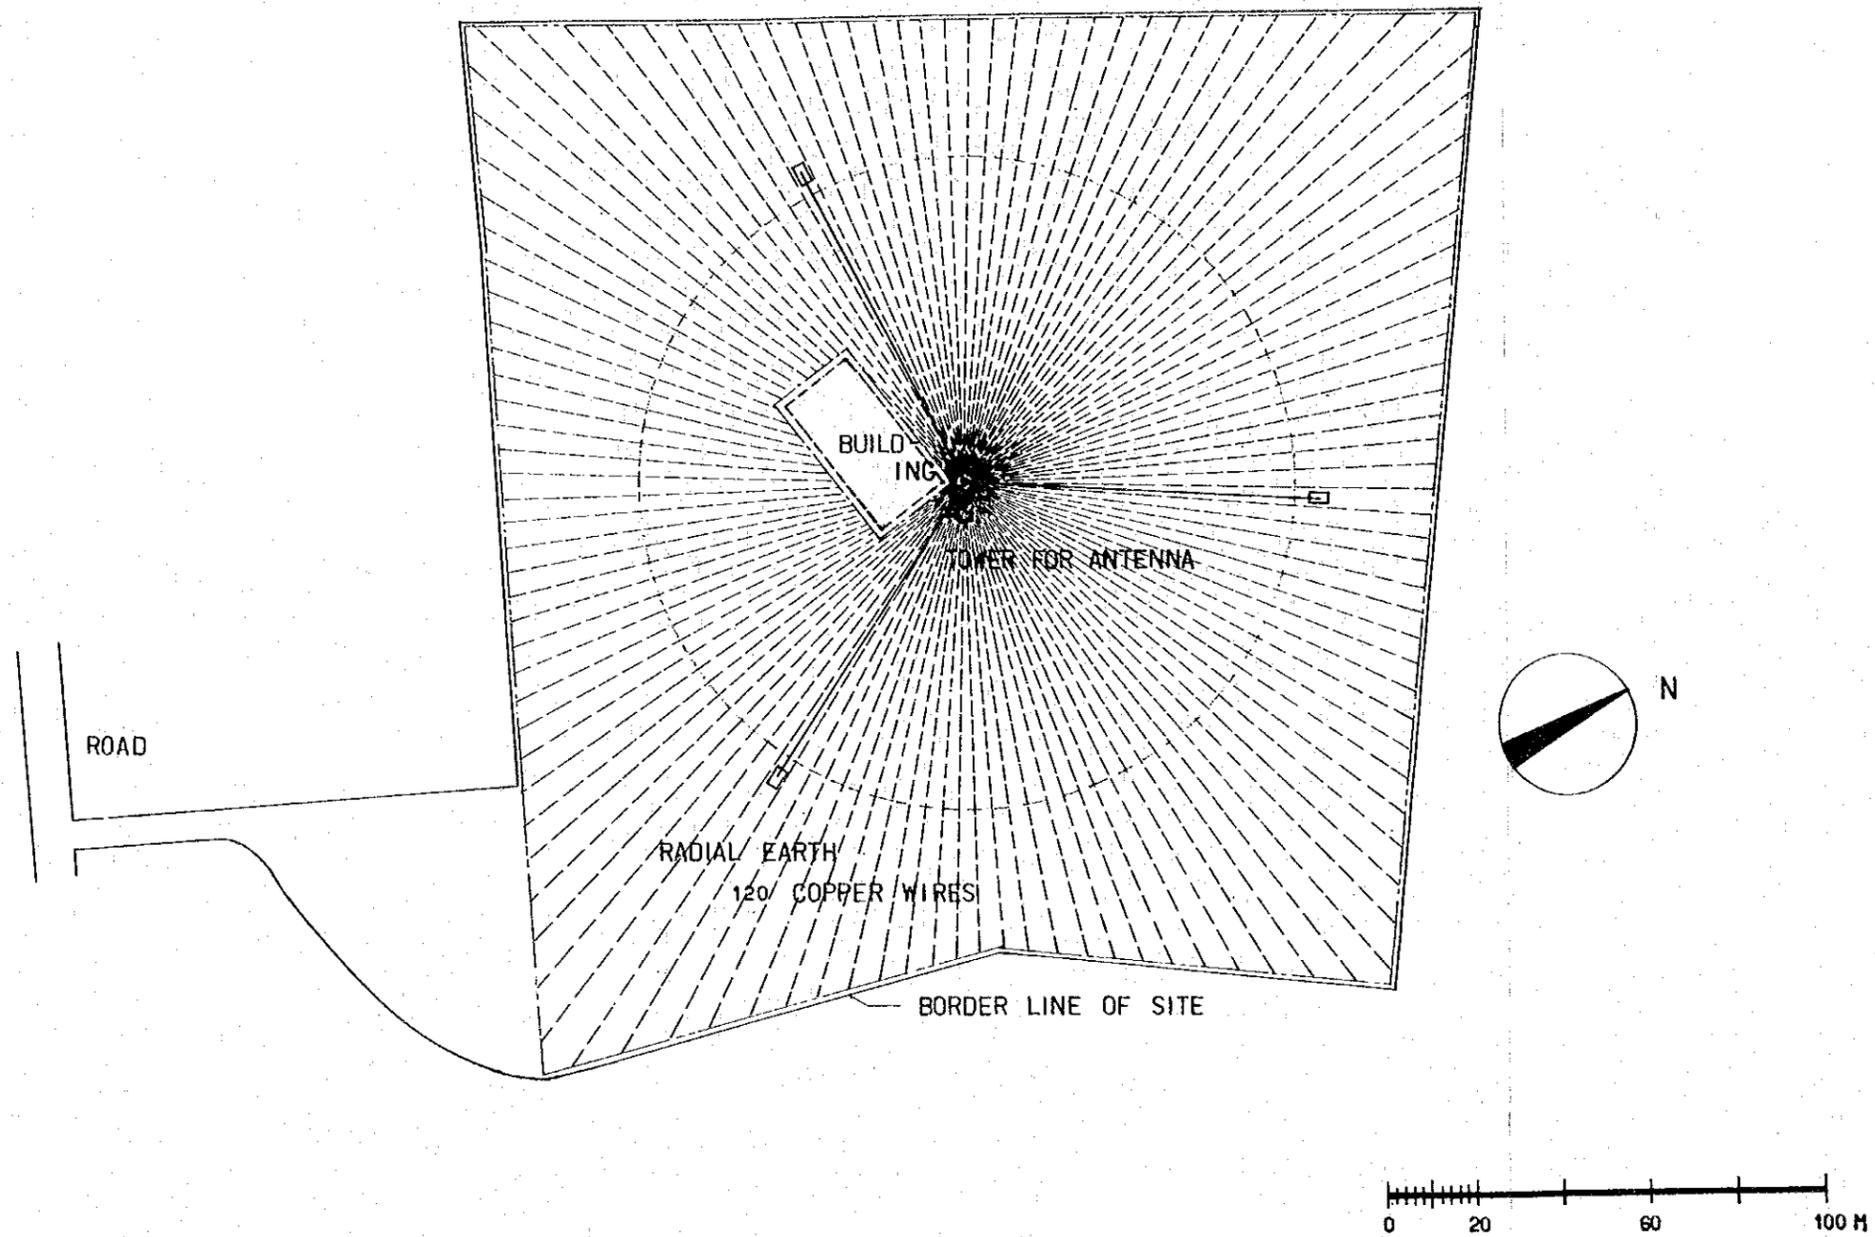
LAY-OUT OF TOWER AND EARTH — POKHARA TRANSMITTING STATION
